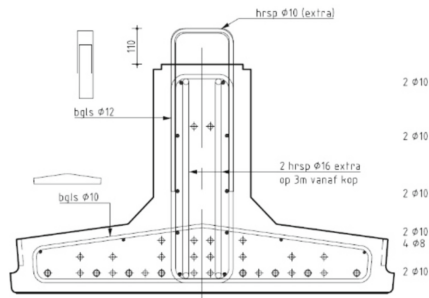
Reinforcement and prestressing strands ($30 \times 15.9 \text{ mm}$) in girder according to Eurocode
